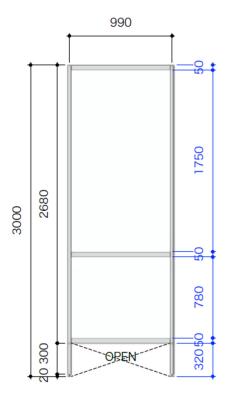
Example of wall unit between System Running Area and Operation Area (unit: mm) (width will be changed as needed).
